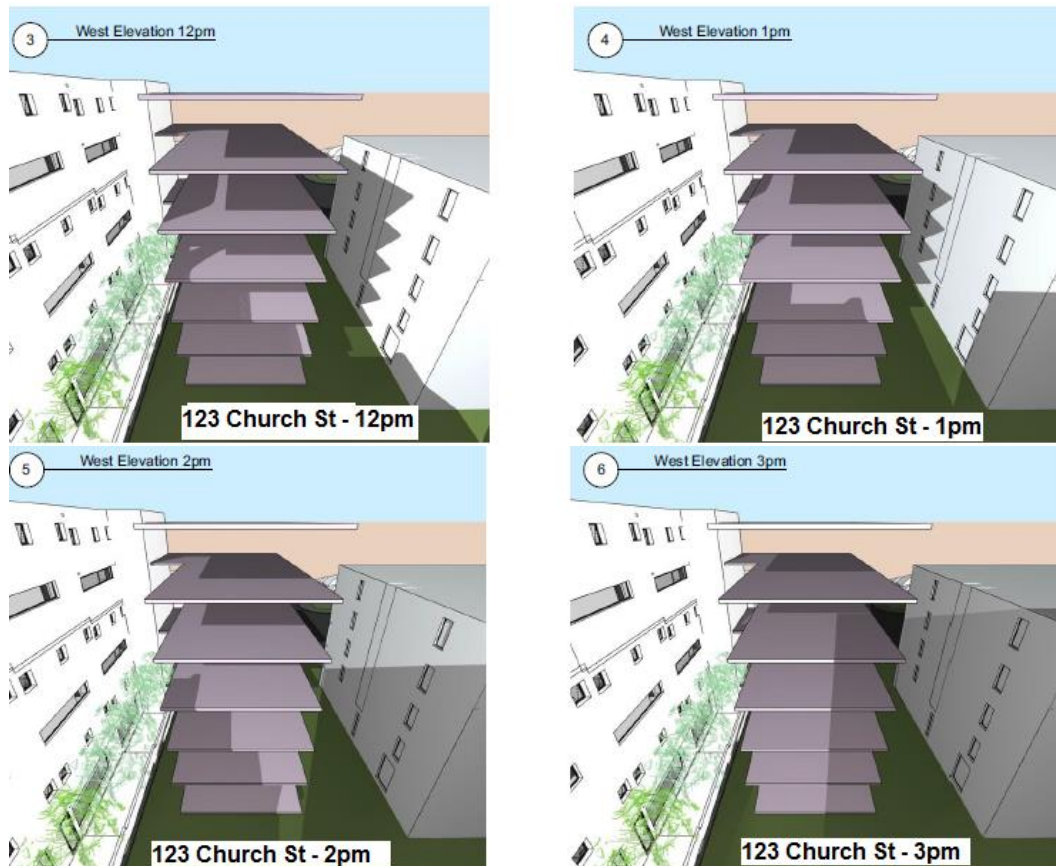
Elevation shadow diagrams illustrating an indicative scheme at 123 Church Street with solar access to the rear apartments from 12pm to 3pm.
